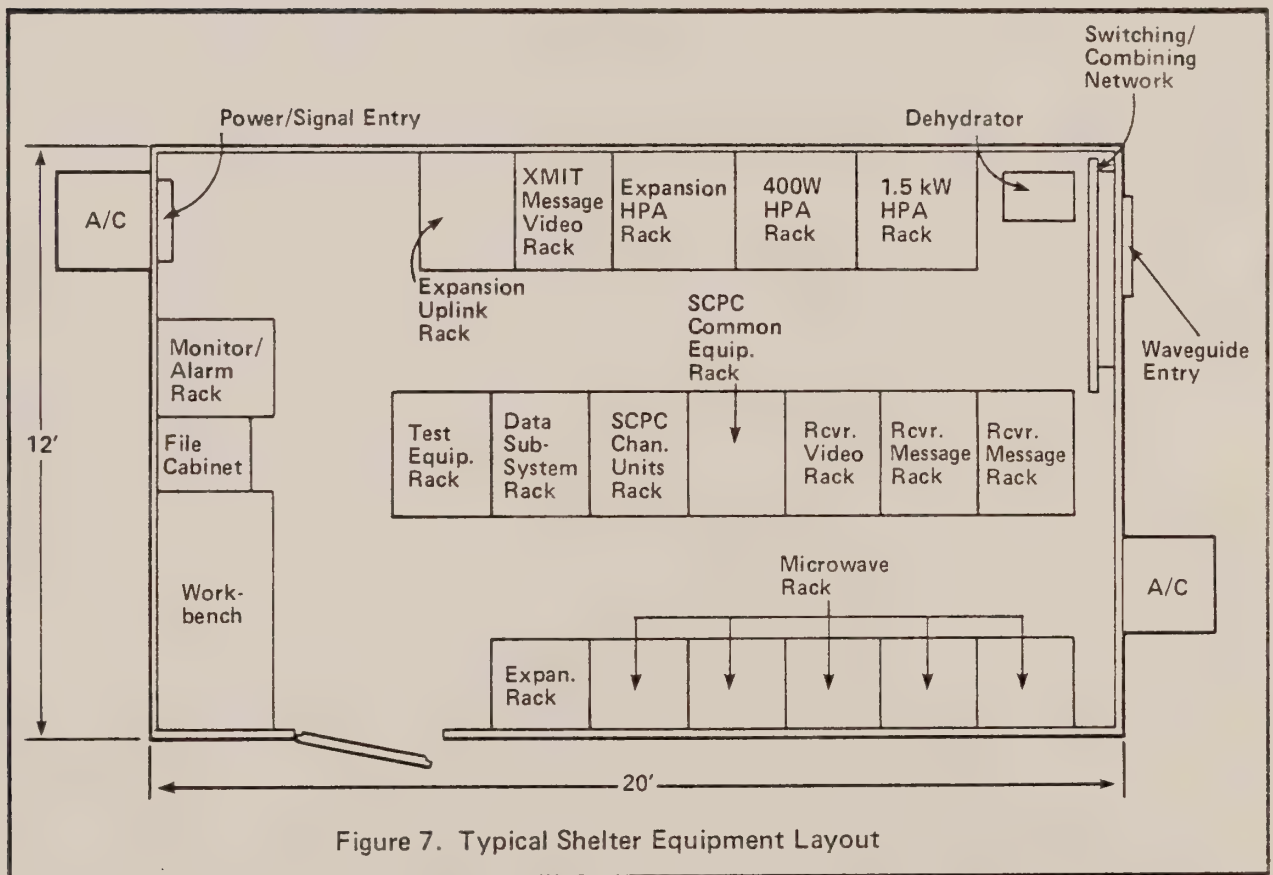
shows the site layout for large T/R earth station. A typical shelter layout is shown in Figure 7. Large amounts of work room and desk space are provided. Expansion may take place freely.
